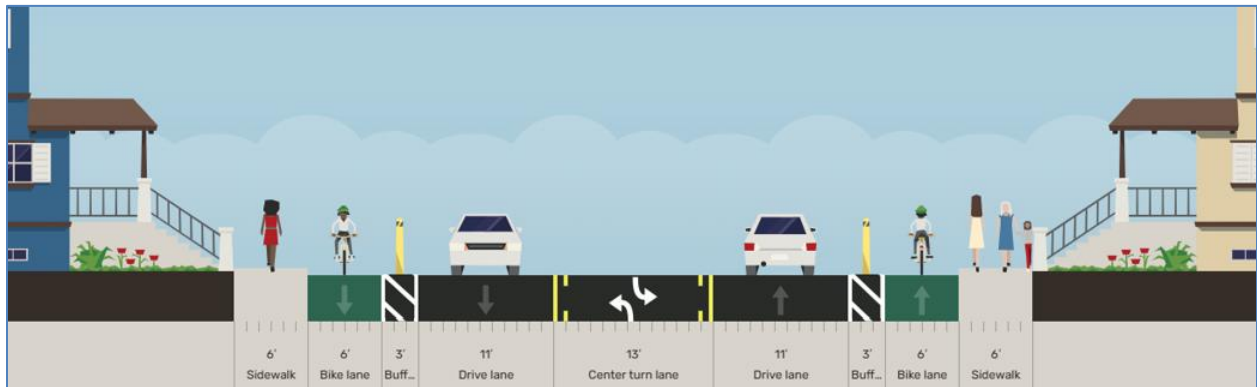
El Monte Avenue Typical Road Diet Cross-Section
